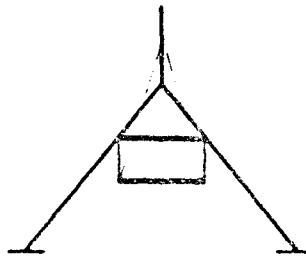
BRACED ARCH BRIDGE CONCEPT
